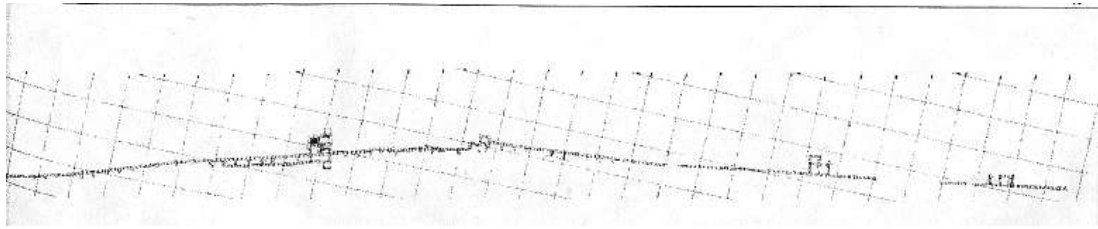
State plan of the north Hellenistic wall at the locality “Makedonika”, Opous; note the jog at Tower 2 (after Bouyia 2000a, plan 2)
